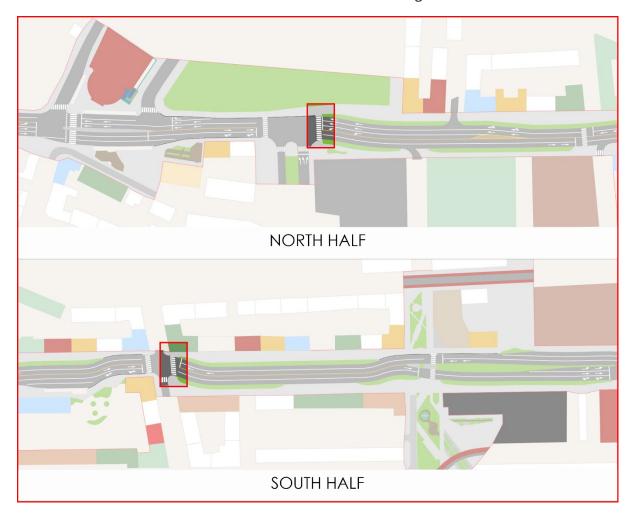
Illustration of Elgeseter Street's new design with new added crosswalks highlighted. (Made by: Susanna Hsu Hals)
